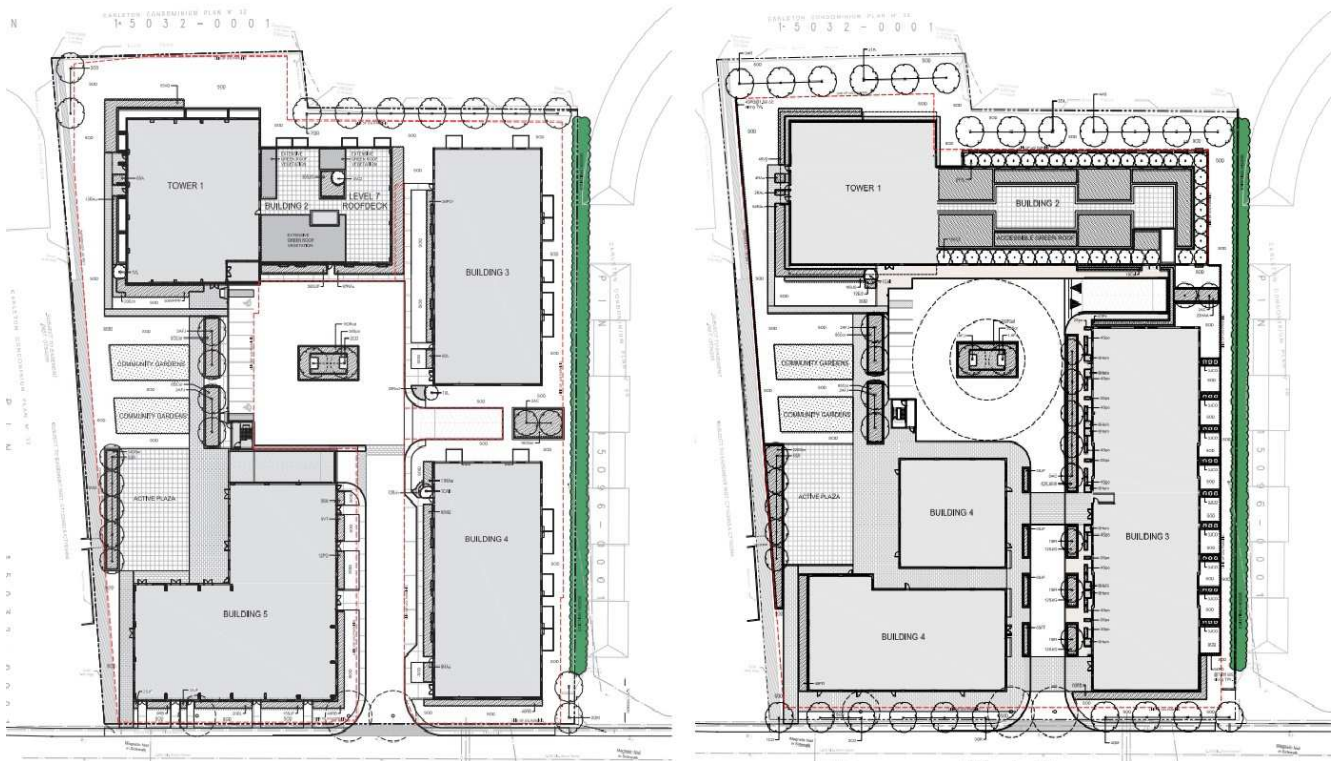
Building layout (Left: original development proposal; Right: revised development proposal)
